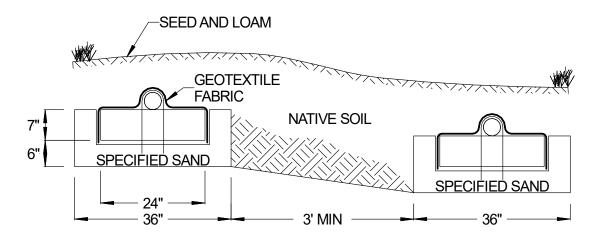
SECTION VIEW - TRENCH SYSTEM - SLOPING SITE
